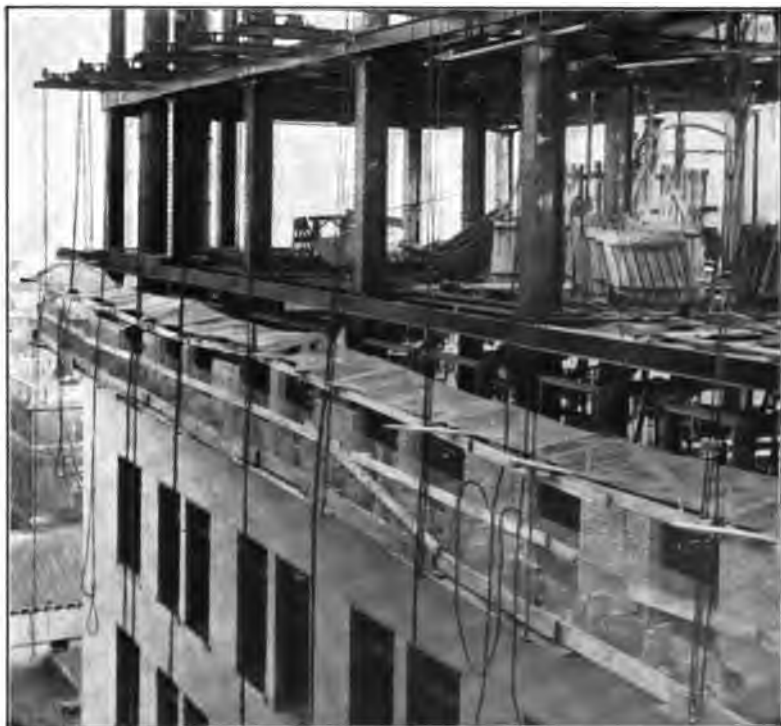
A SCAFFOLD PLATFORM WITH AN OVERHEAD PROTECTION OF WIRE NETTING.
